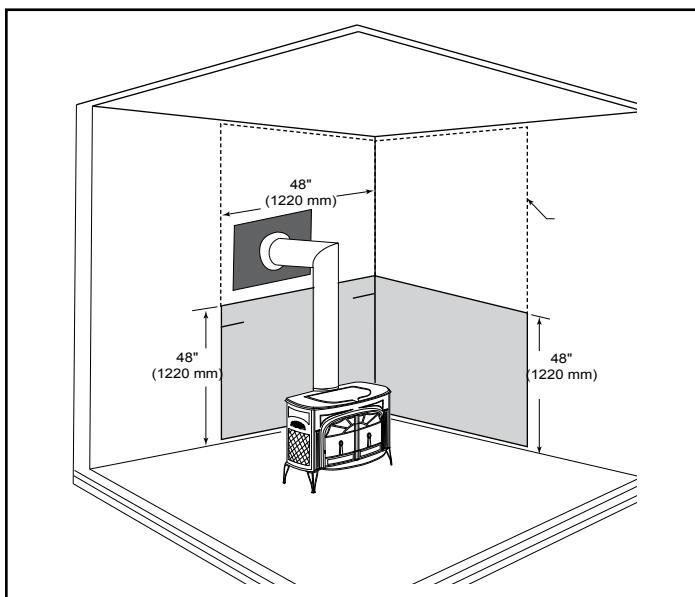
Parallel installation with rear wall pass-through, two wall shields. Reduced clearances to both rear and side walls. Wall shields may meet at corner if desired. Wall pass-through must comply with codes.
